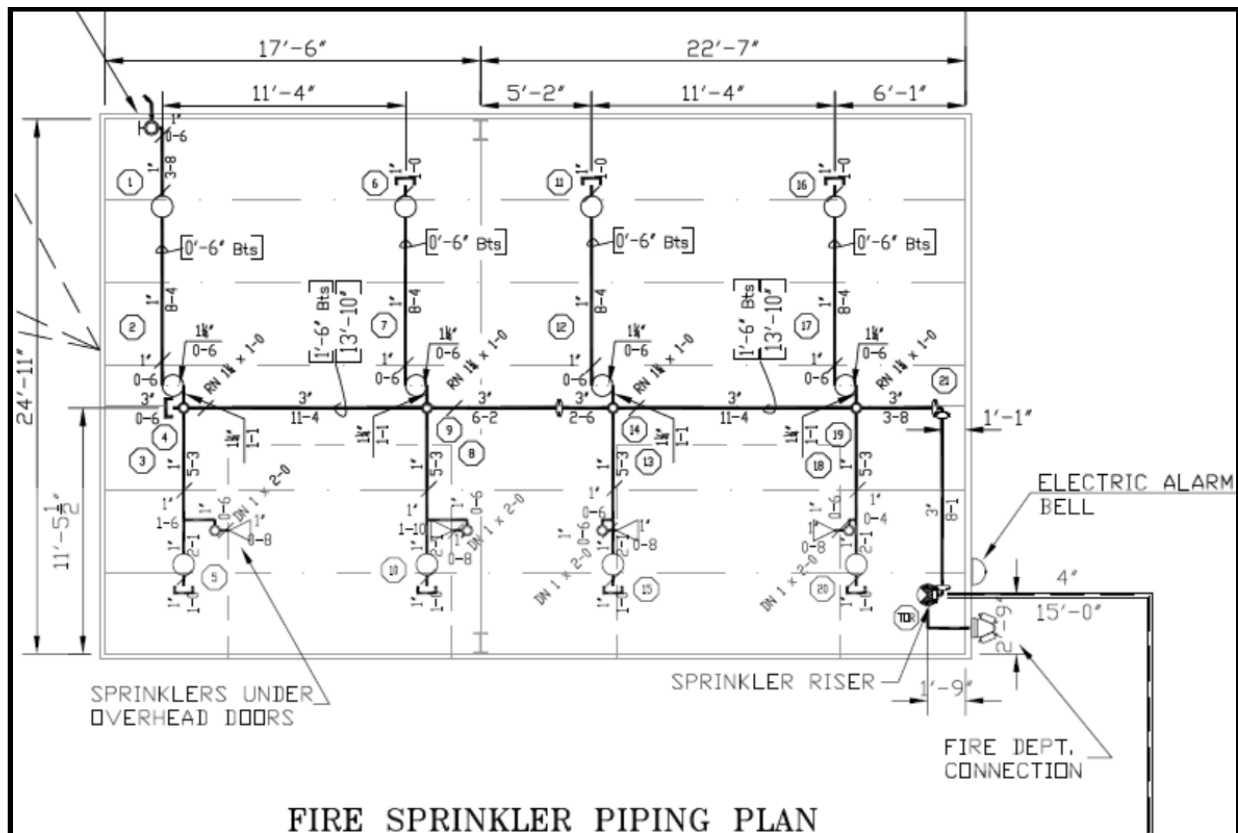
Fire Sprinkler Piping Plan for Missouri S&T EcoCAR Garage
